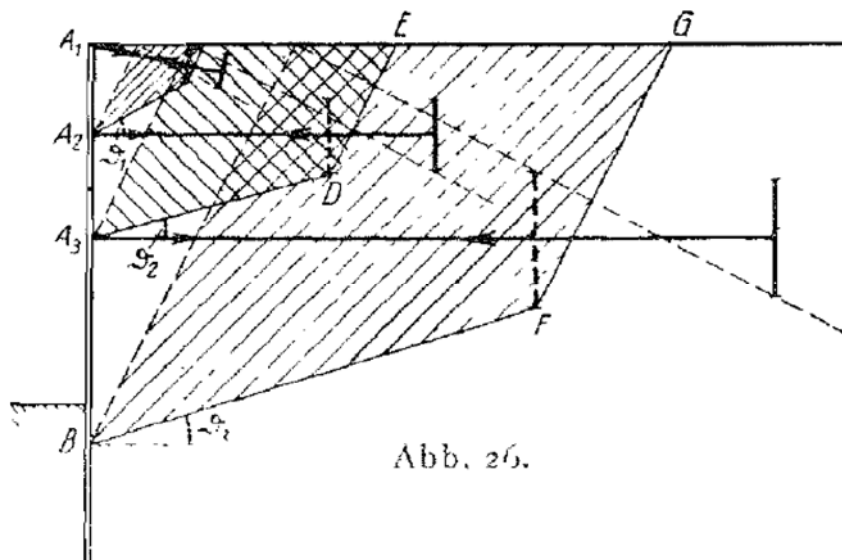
Example for an often-used construction for multiple anchored sheet pile walls [1]
